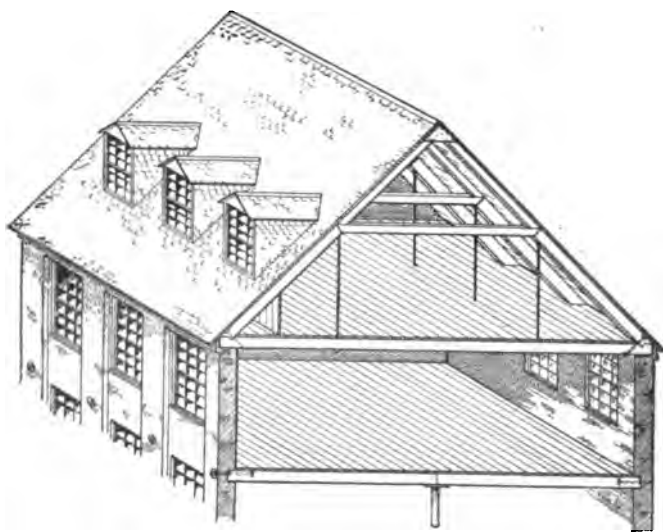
THE BARN ROOF AS APPLIED TO MILLS.
